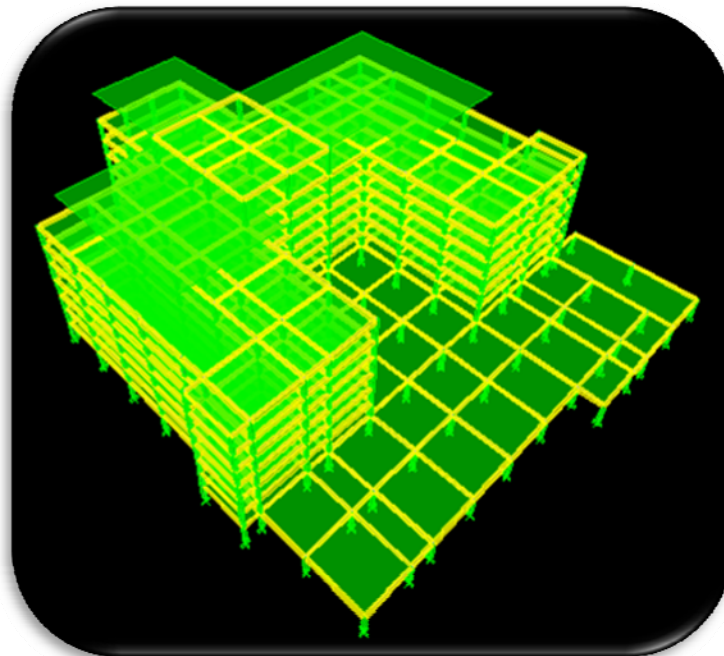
Original Concrete Moment Frame ETABS 3D Model
